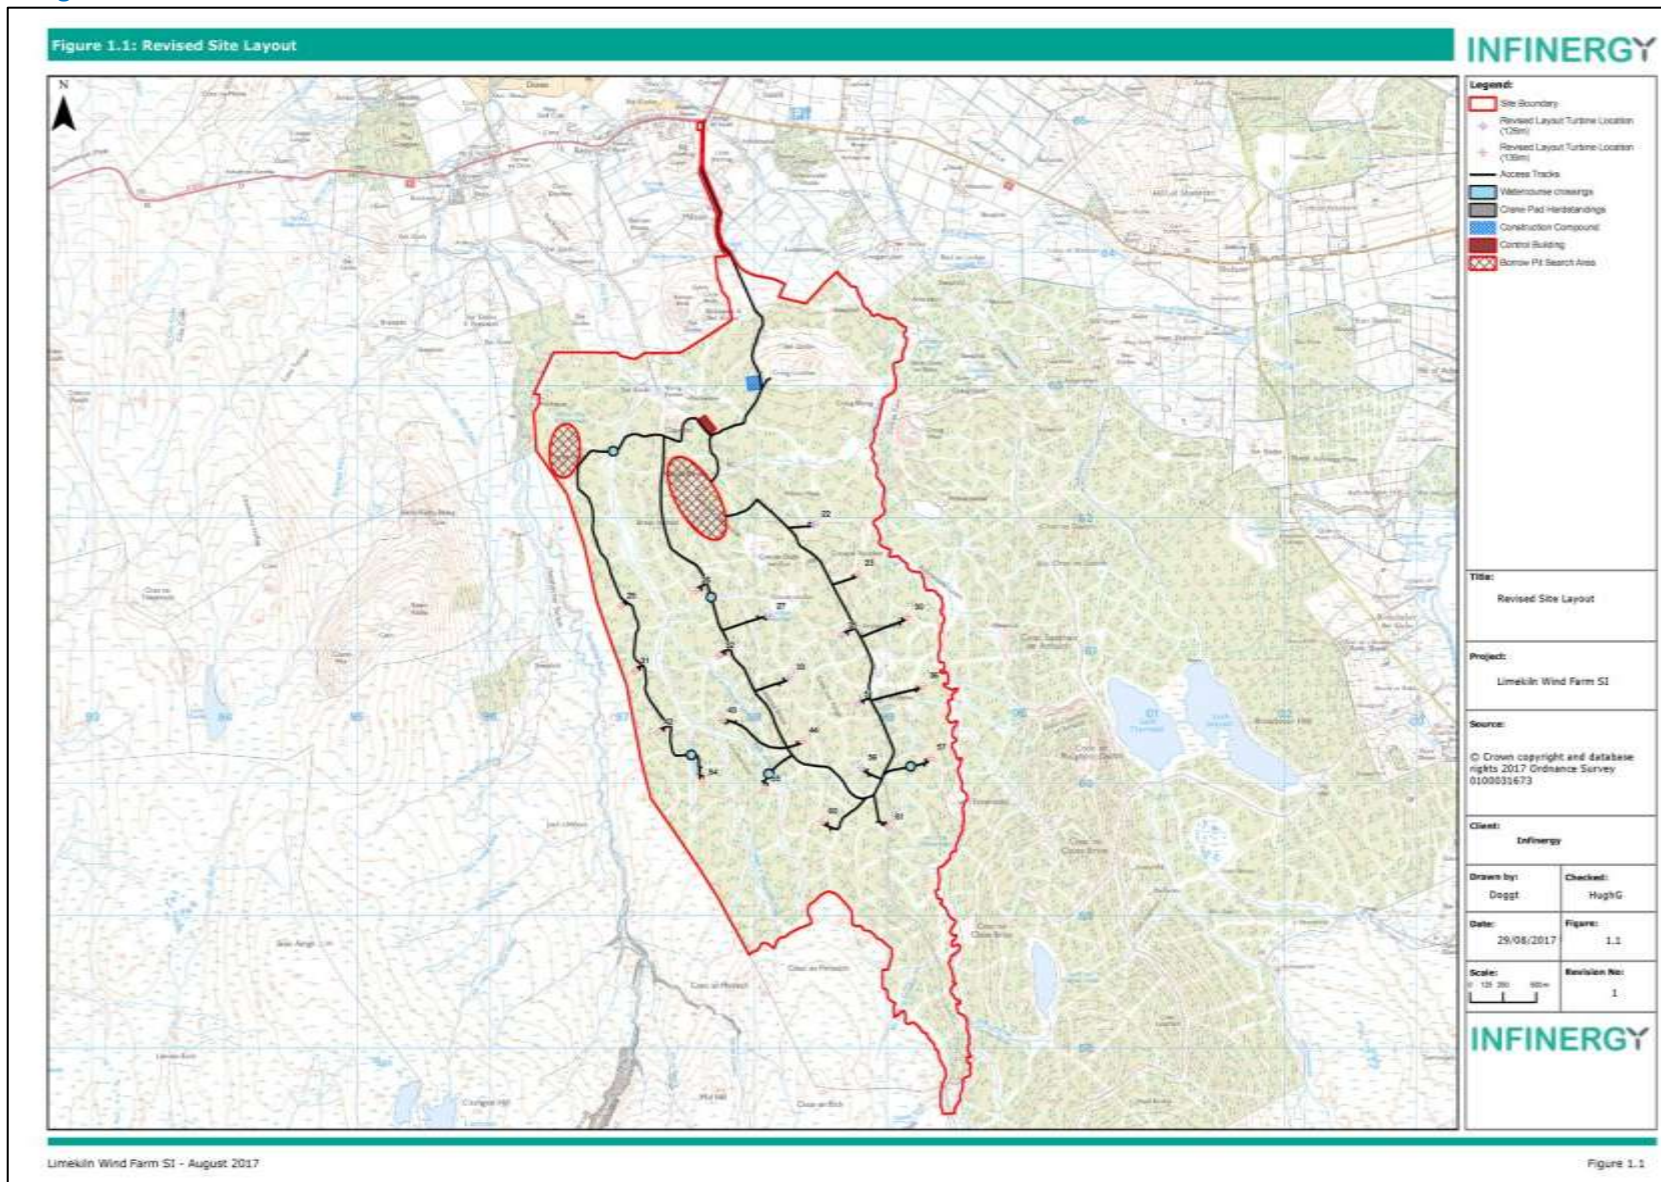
Plan showing site boundary and development layout (scale shown) (Courtesy of Client)
